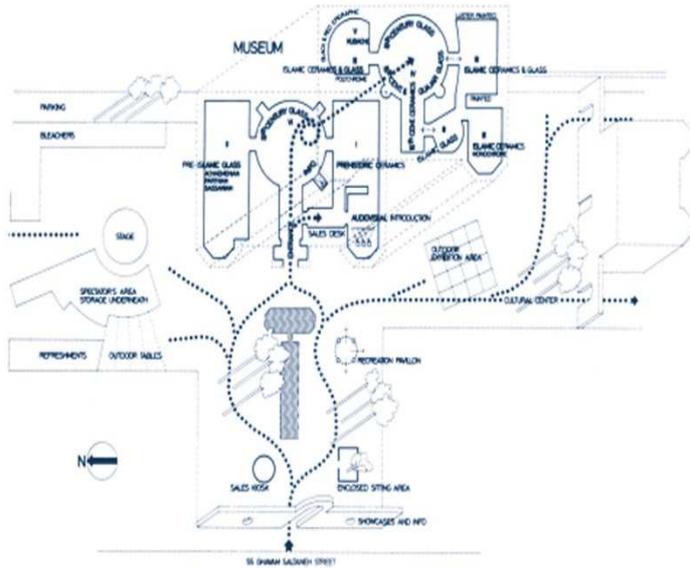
Mas'udieh complex's plan (Khorshidconstruction, 2011)
